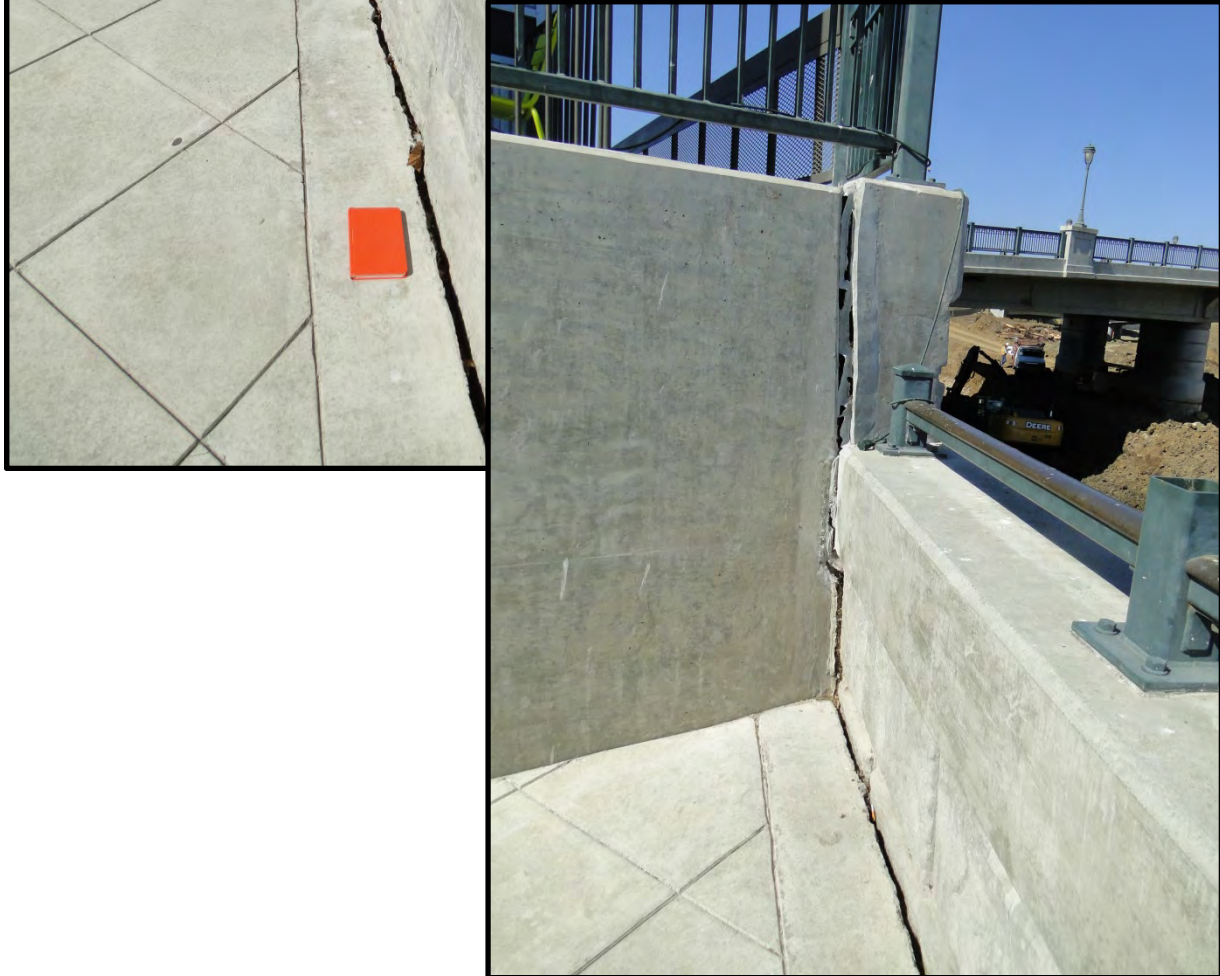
Separation of concrete slab and retaining wall from Napa River floodwall along right bank of Napa River looking upstream from Third Street Bridge [NSF-GEER; Napa, CA; N38.299 W 122.285; Harder, L. F.; 09/04/14]
